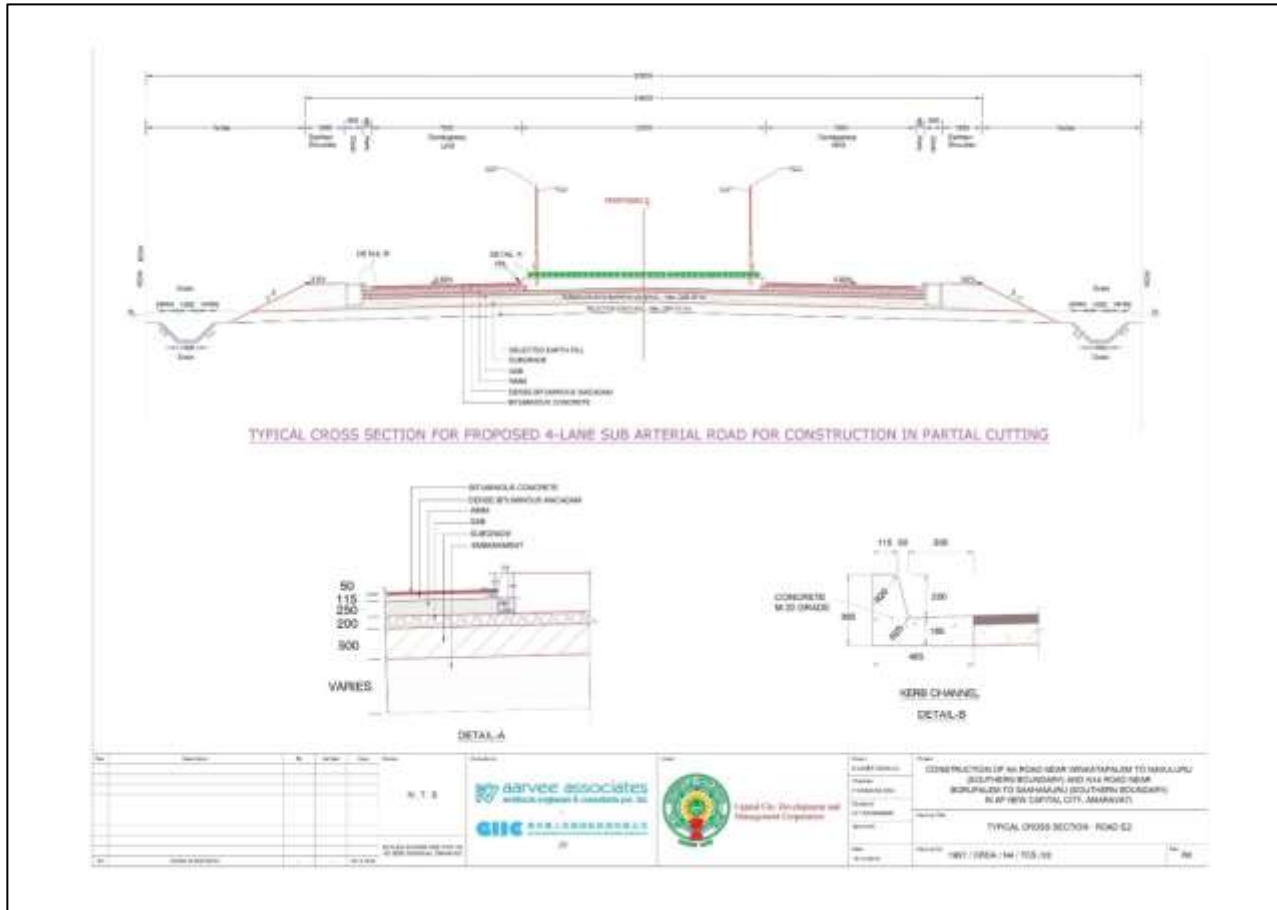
TCS for proposed 4-Lane Sub-arterial road for construction in Partial Cutting
